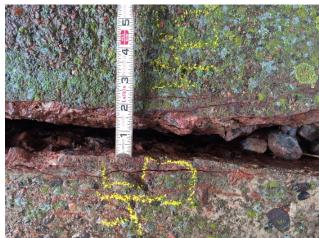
Expansion joint on pile cap floor between Sections 4 and 5. Note no expansion joint material contained within joint, and concrete scaling and cracking.
